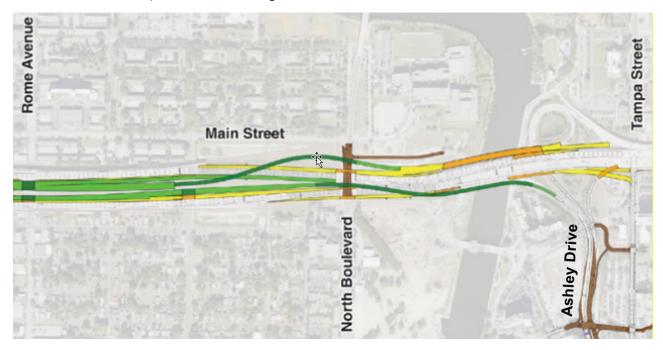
I-275 Improvements Rome Avenue to Ashley Drive/Tampa Street
